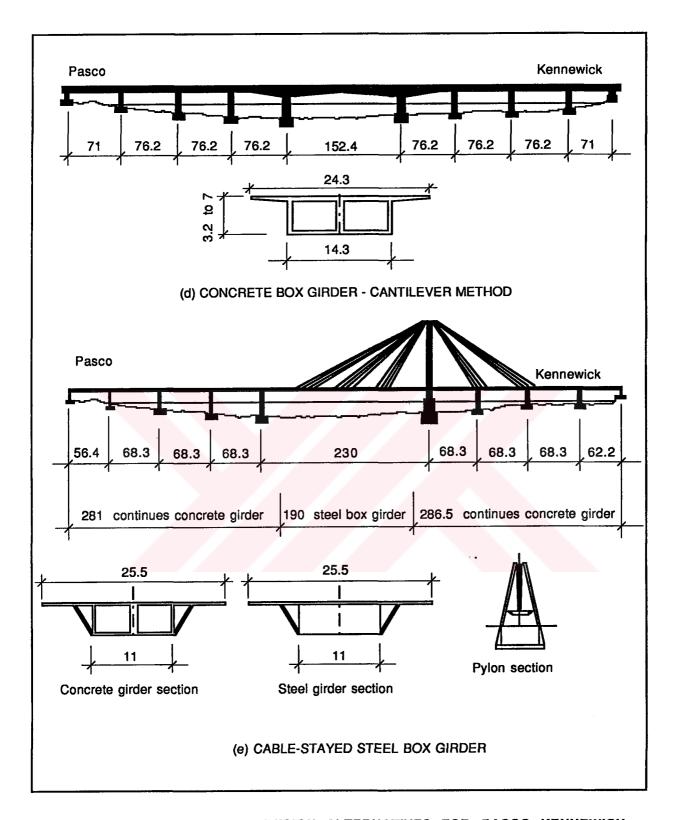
PRELIMINARY DESIGN ALTERNATIVES FOR PASCO KENNEWICK BRIDGE (in meters)
